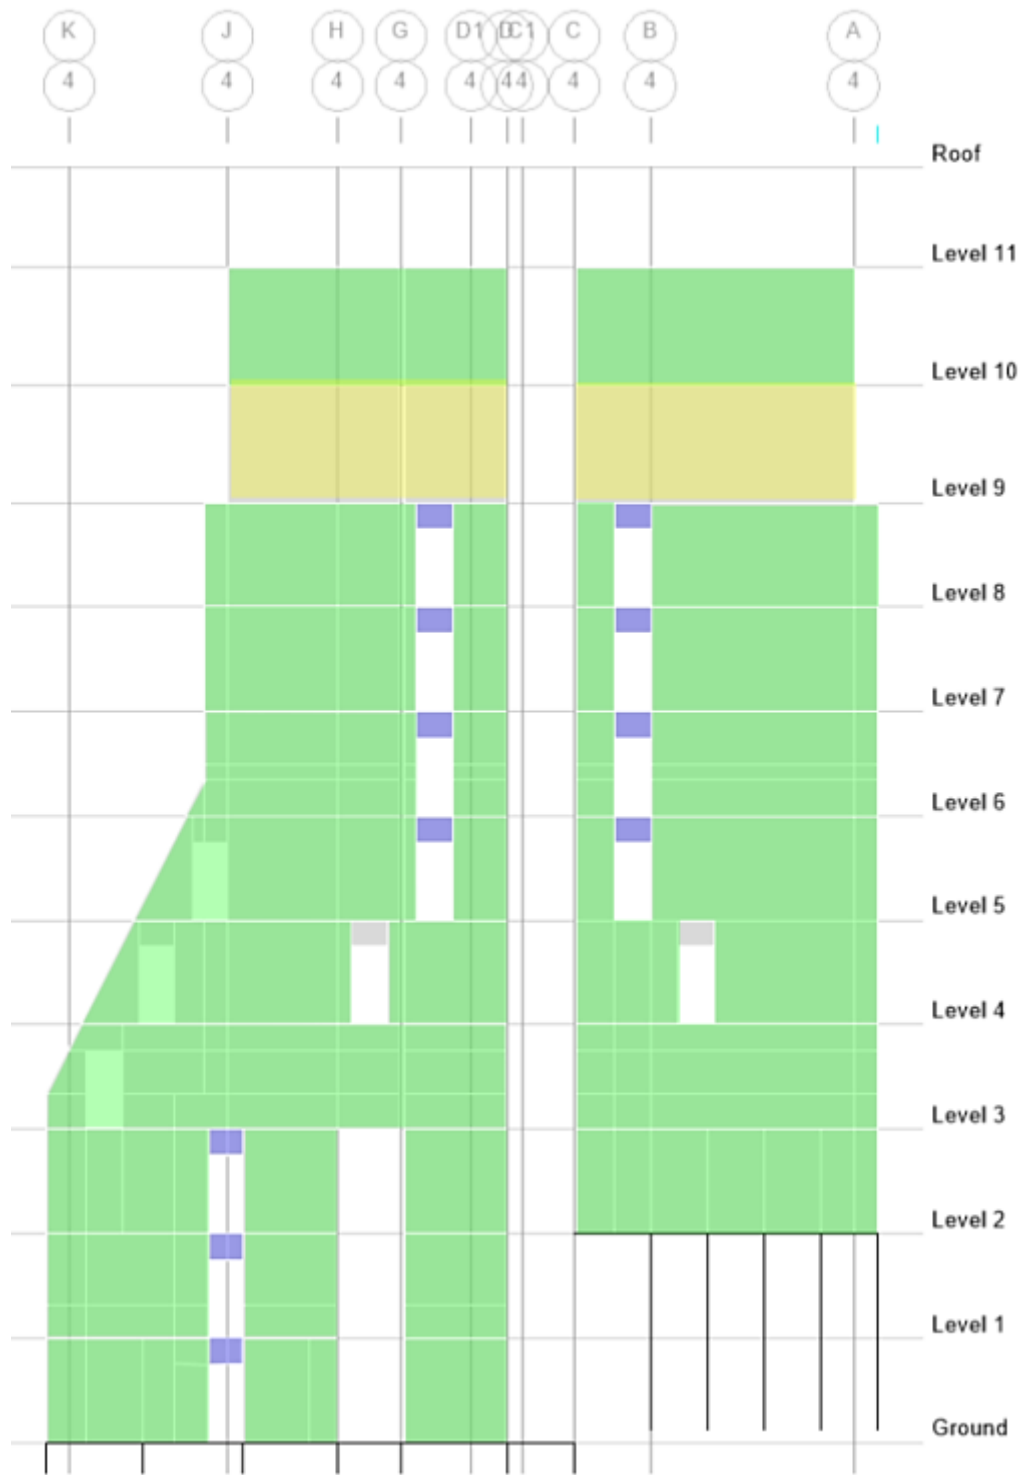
, Gridline 4 Transverse Direction Wall – North Structure
